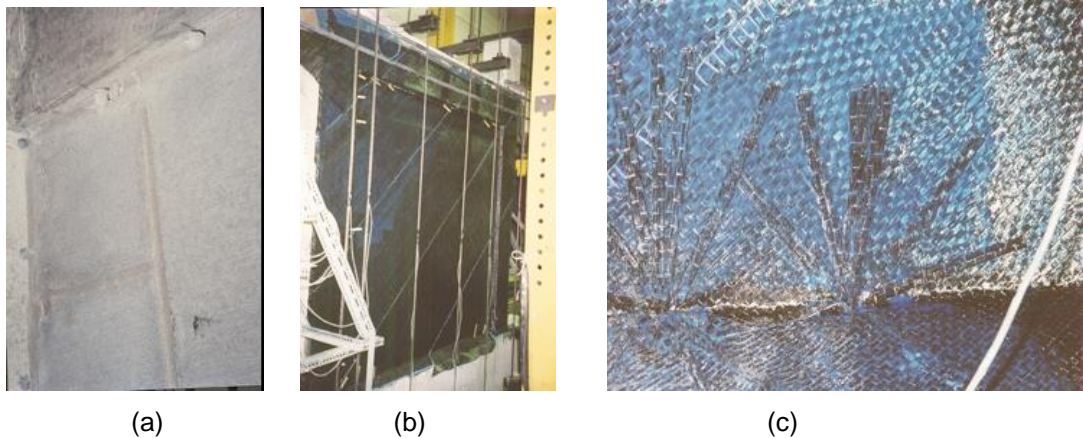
Installation of CFRP anchors, (a) Pre-drilled holes, (b) Wooden guides, (c) Anchors in place
